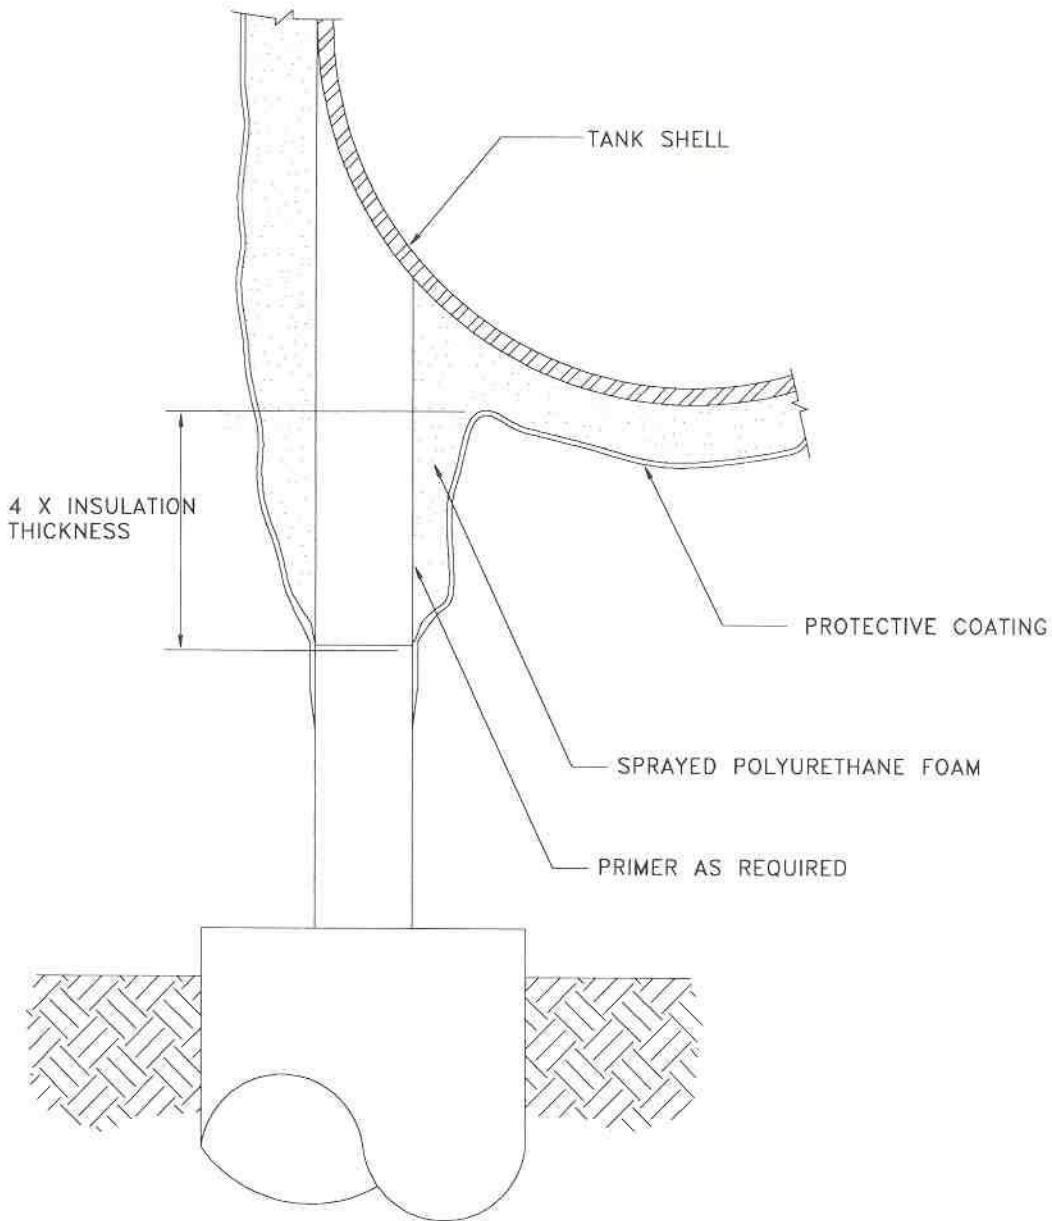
INSULATION OF VESSEL LUGS AND SUPPORTING STEEL
